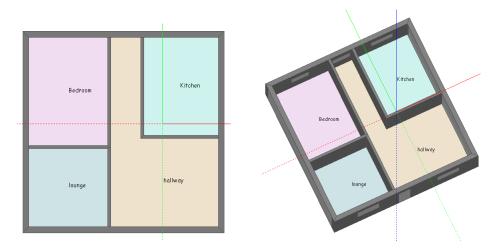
Floor plan of Ground floor Mid-terrace Model (and view with doors and windows)
